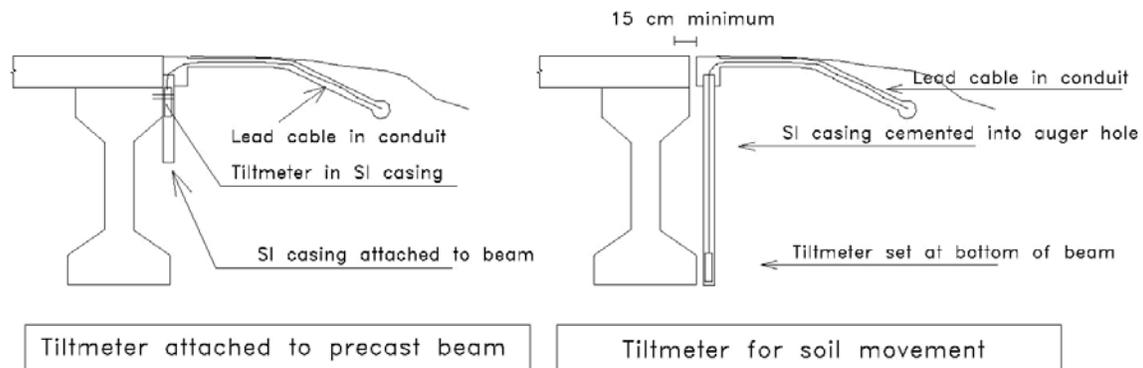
Cross section of the precast concrete beams and installation details for tiltmeters, SR 66, Highlands County, Florida.
